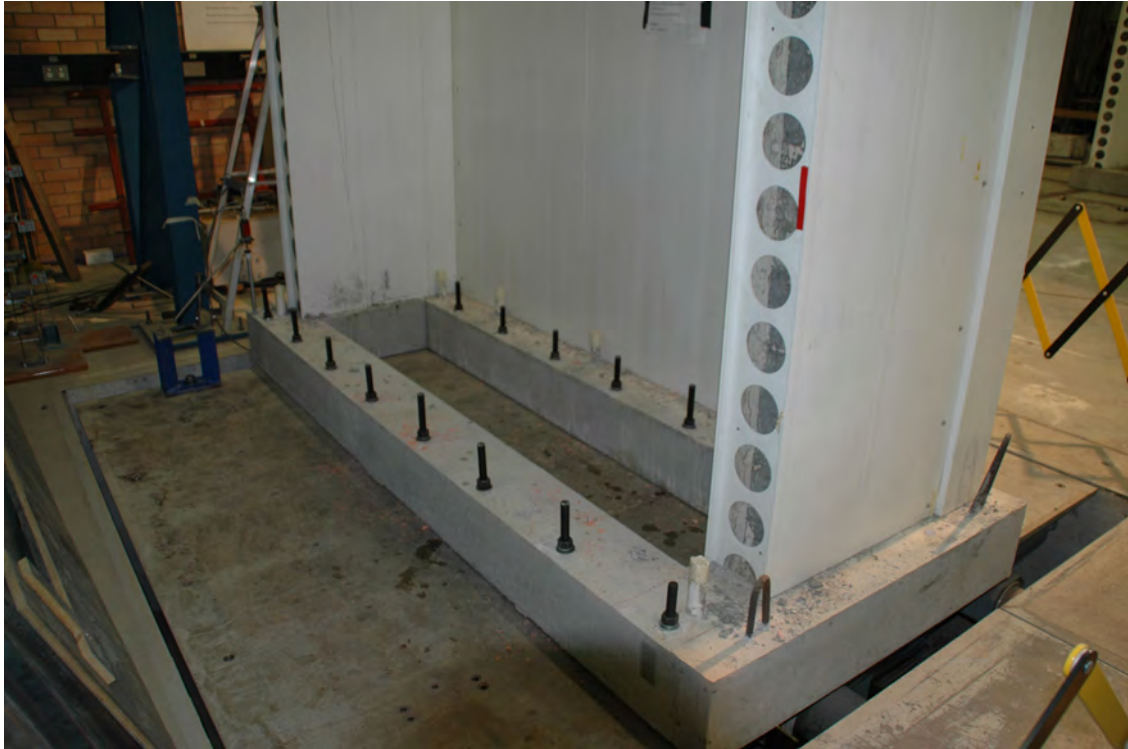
Unreinforced Wall unit and base on UTS shake table prior to testing
